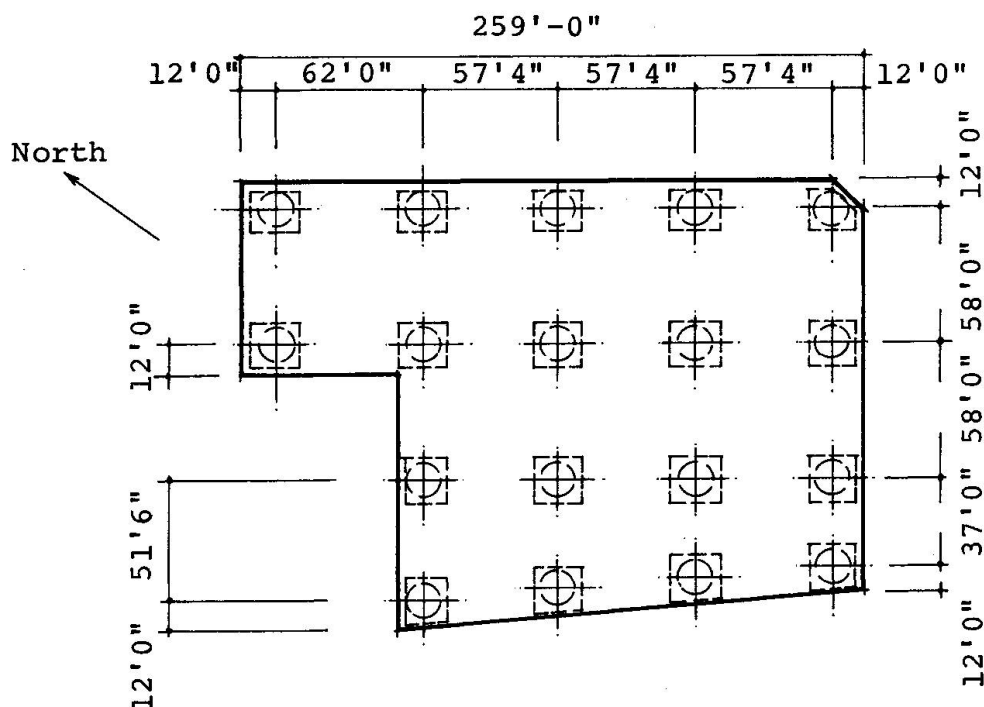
PLAN OF DECK AND COLUMN GRID LAYOUT
